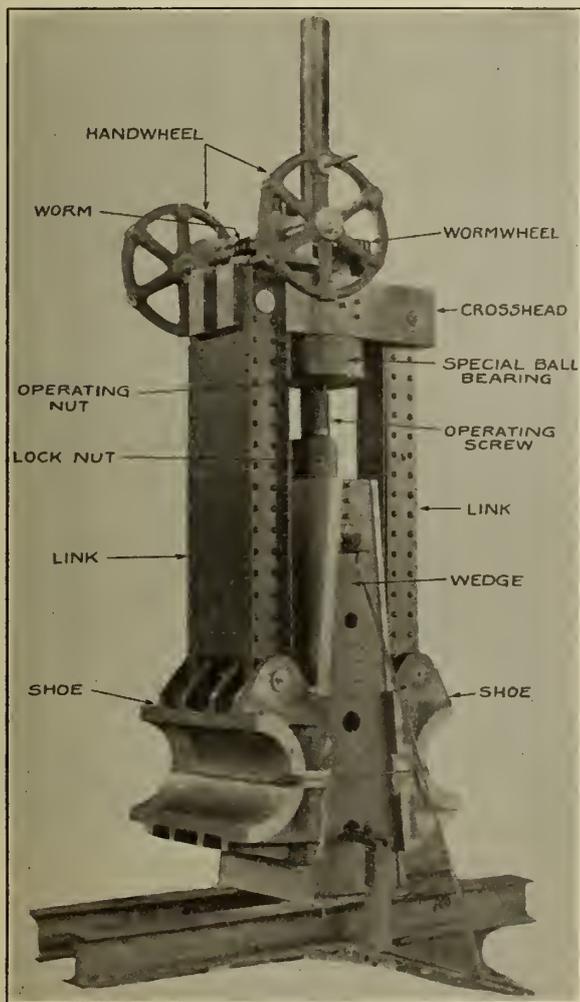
Wedge Mechanisms used in Erection of Suspended Span.
